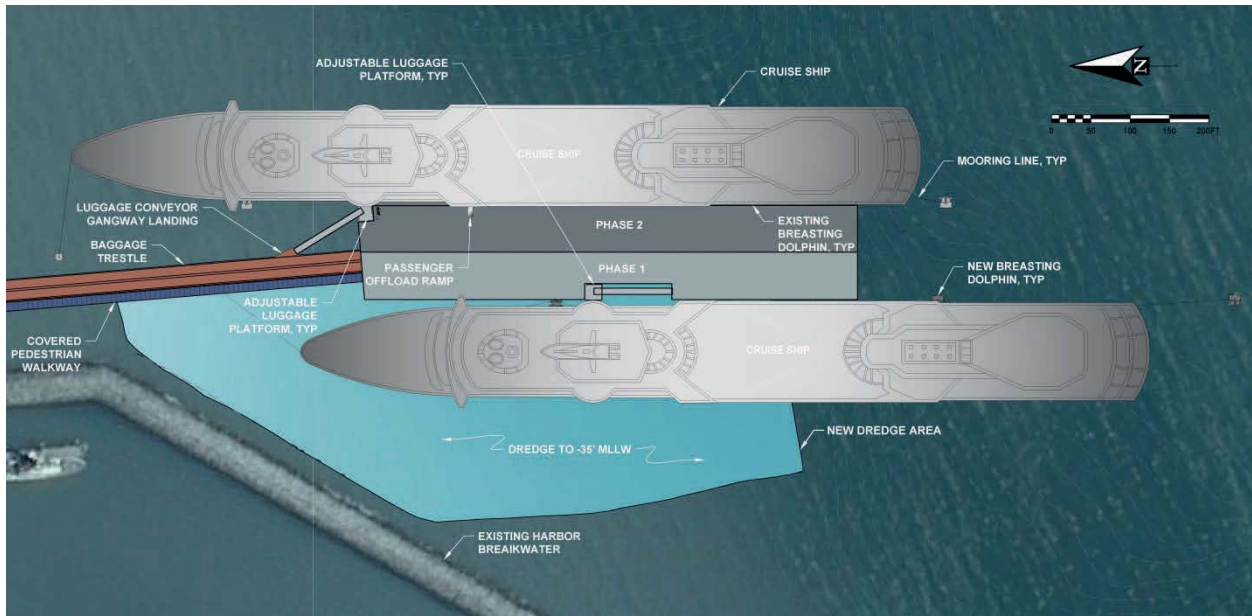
Option P-PD7: Seward Loading Facility Pile Supported Platform Dock Expansion
